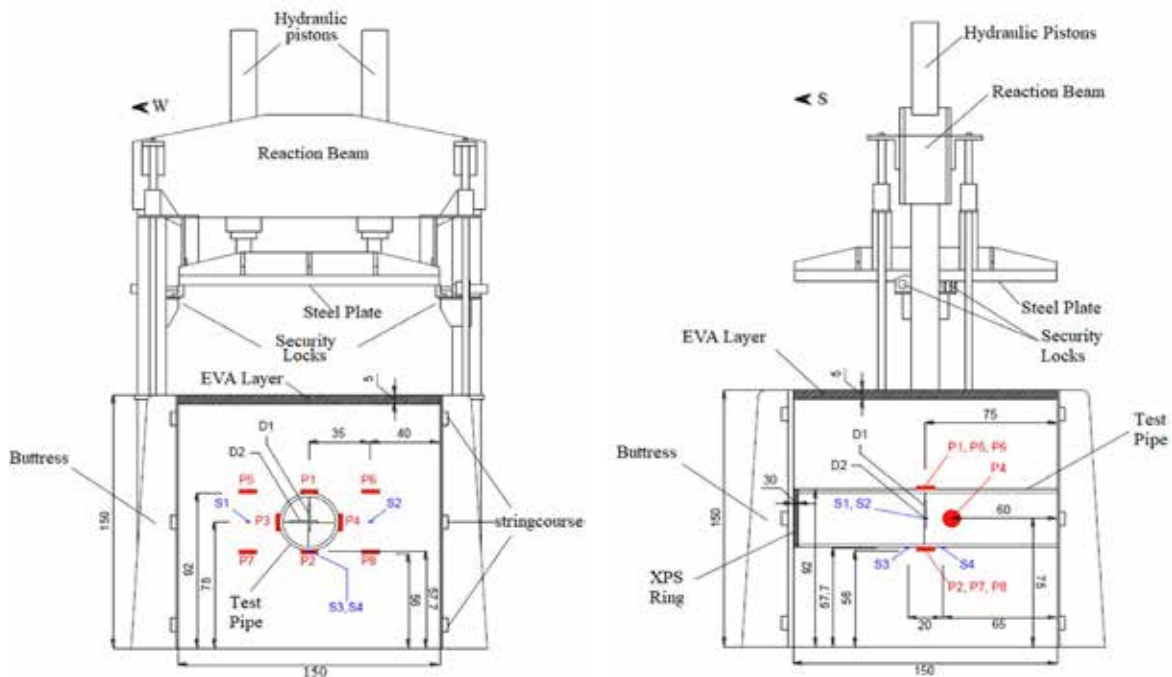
Full-scale laboratory test facility, locations of test pipe, and instrumentation (Akınay, 2017)
